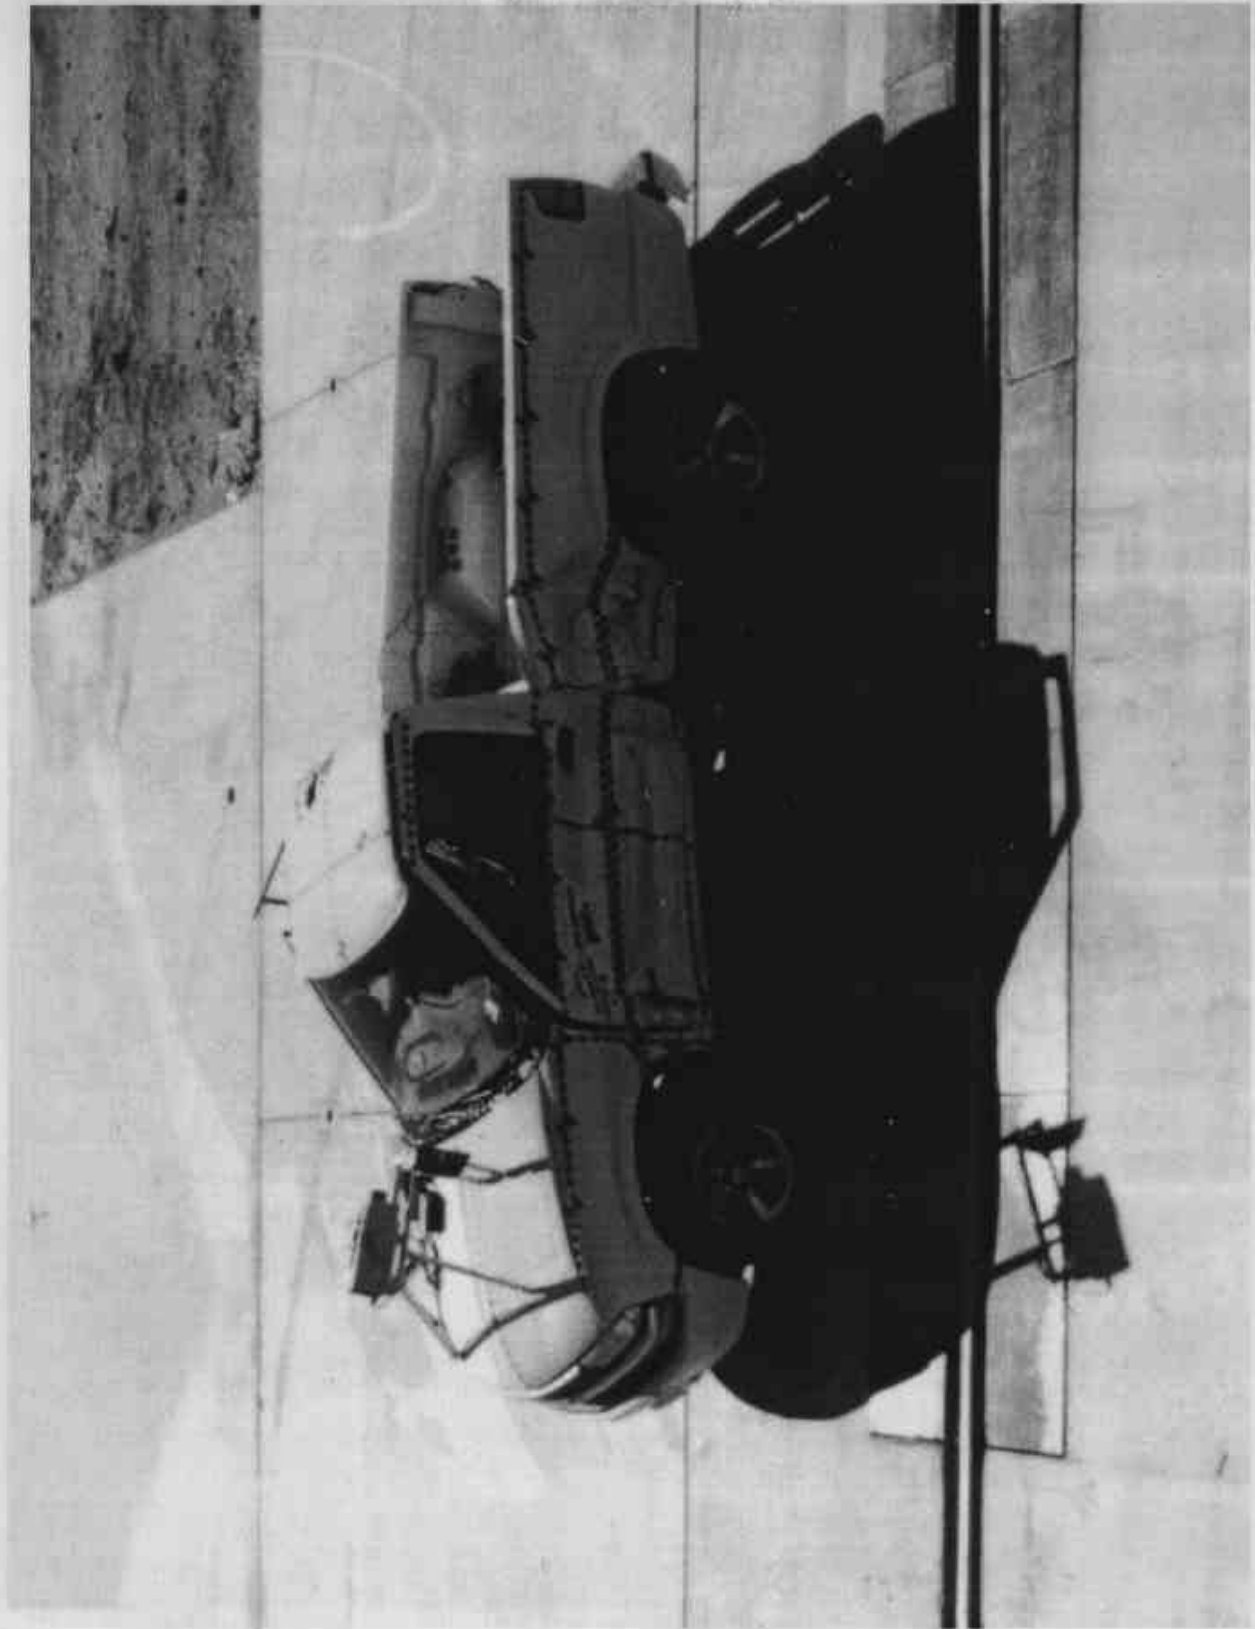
POST-TEST OVERHEAD OVERALL
